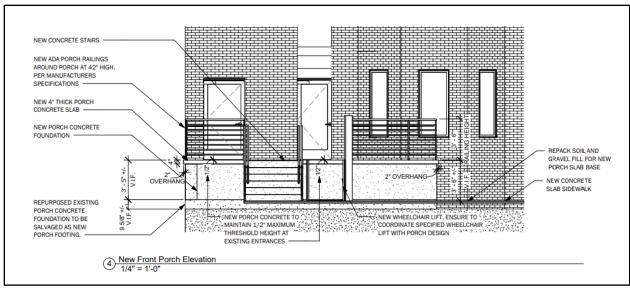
Elevation of Proposed Front Porch, Originally Submitted by Applicant
